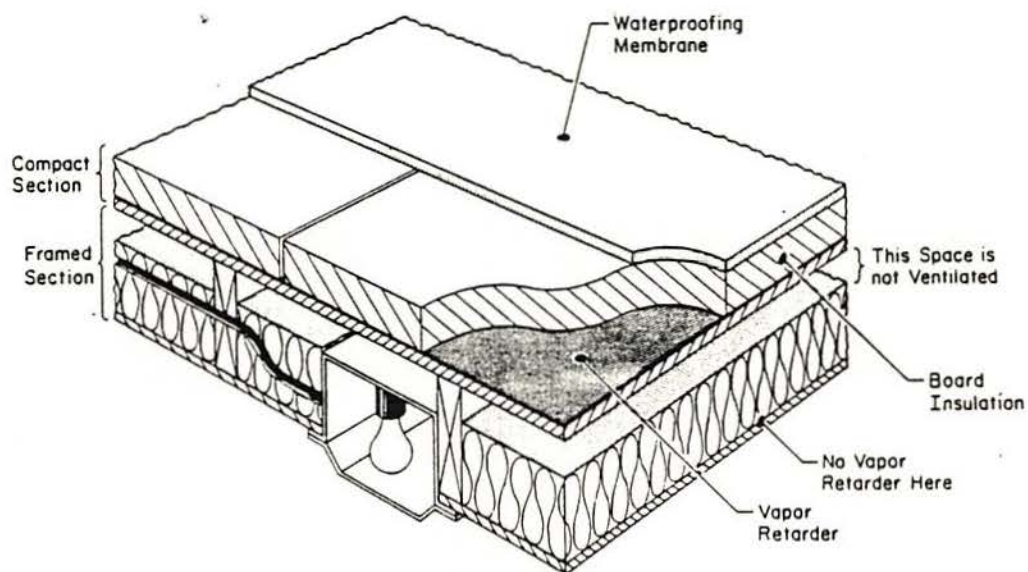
Unventilated wood-framed roof with insulation in compact and framed portions.
